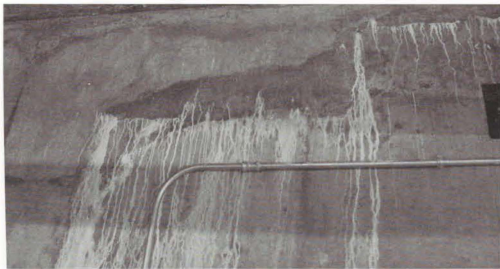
(Left). Detail of construction joint with efflorescence, plotting room south doorway, east side.
